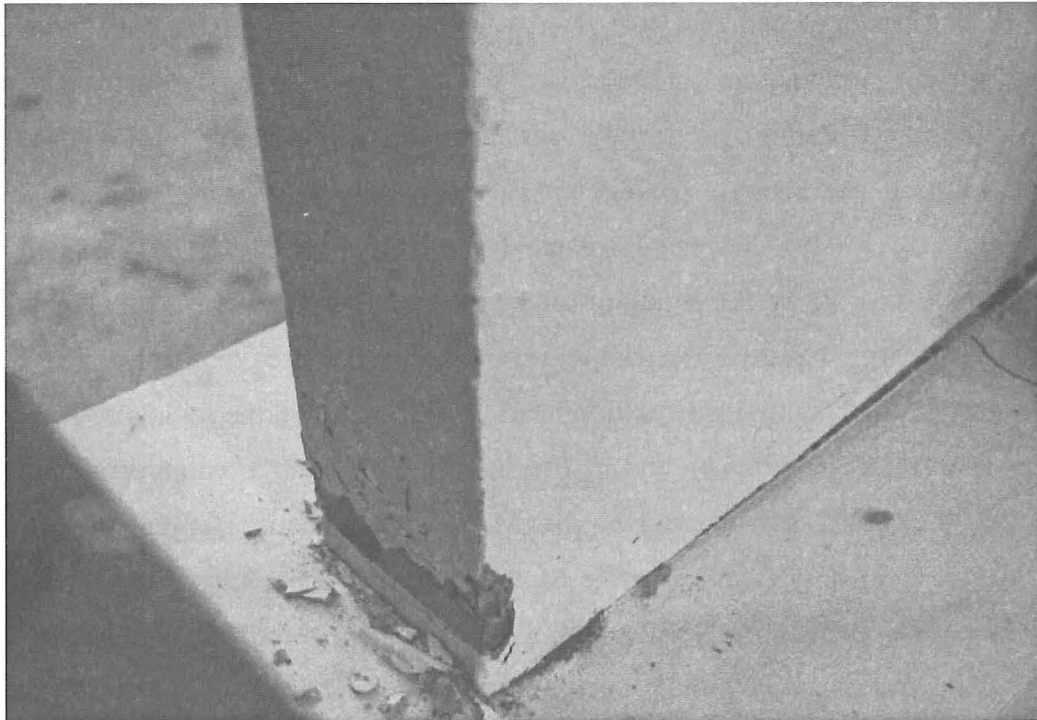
Extent of concrete spalling in the south-western corner of Unit 2 at the end of the test.
